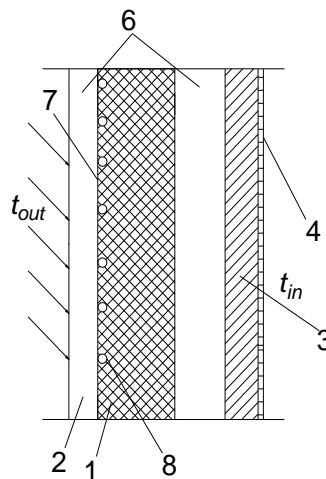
Top view of the energy-active outer fencing cut: 1 — heat storage bearing layer of the enclosing construction; 2 — translucent cover; 3 — heat insulating material; 4 — interior furnishing; 5 — valves; 6 — air gap; 7 — dark paint coating with a high coefficient of thermal conductivity; 8 — pipes with the heat conductor.
